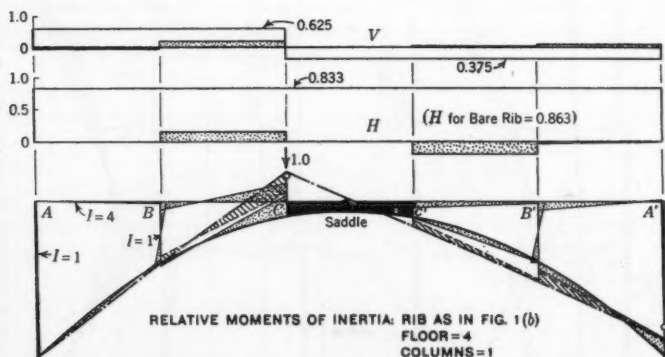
MOMENT DIAGRAM FOR UNIT LOAD AT POINT C ON RIB WITH LOW DECK AND SADDLE.
